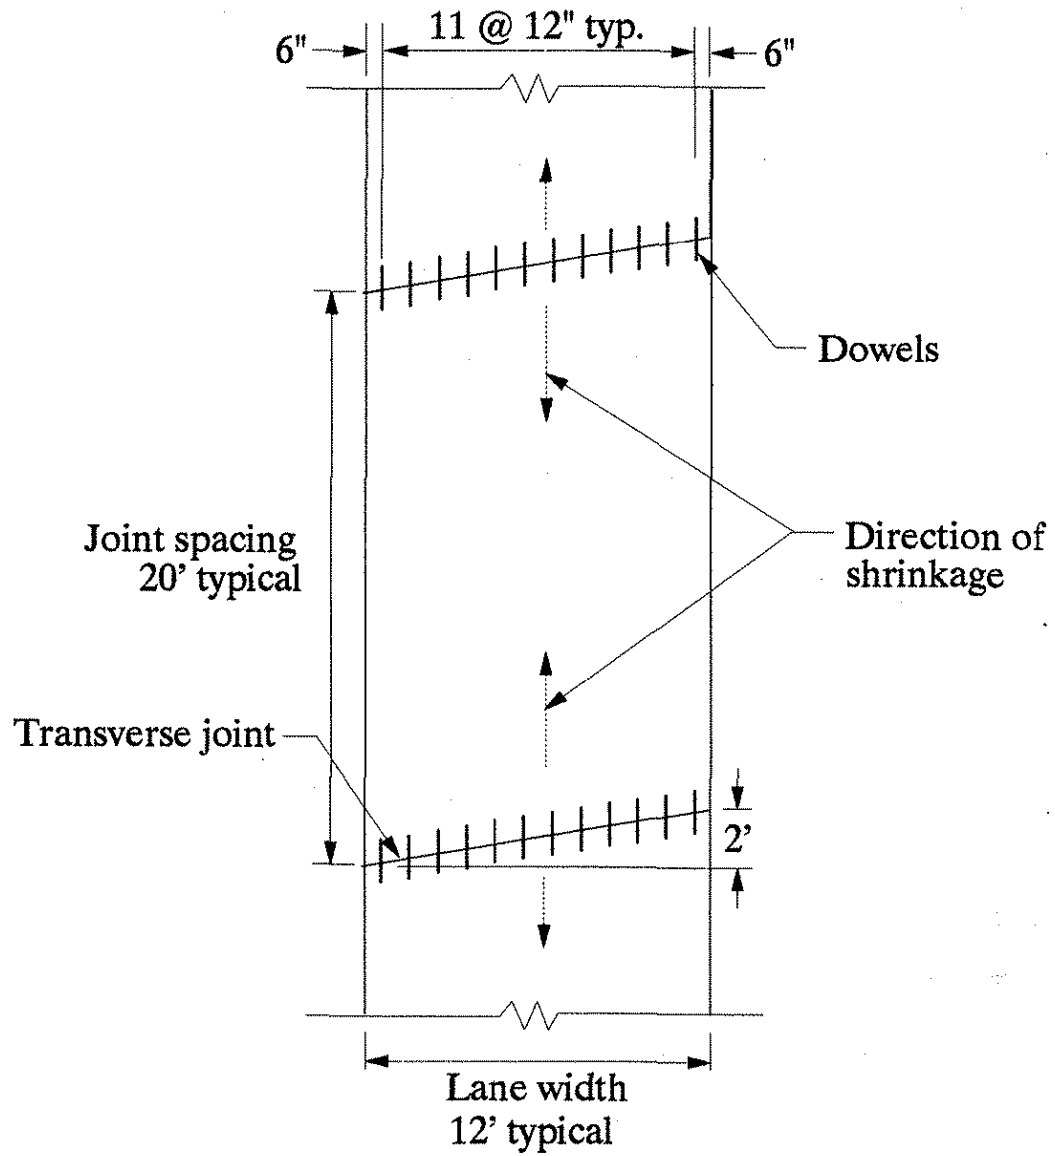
Typical jointed concrete highway pavement using dowels at transverse joints
